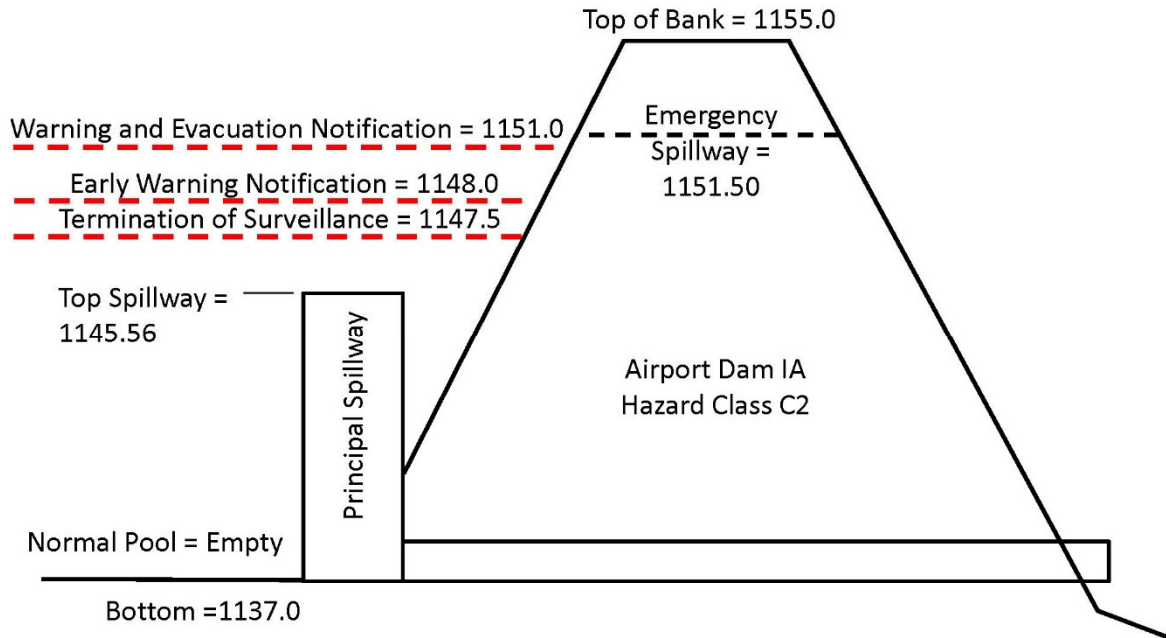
Airport Dam 1A Water Surface Notification Elevations
